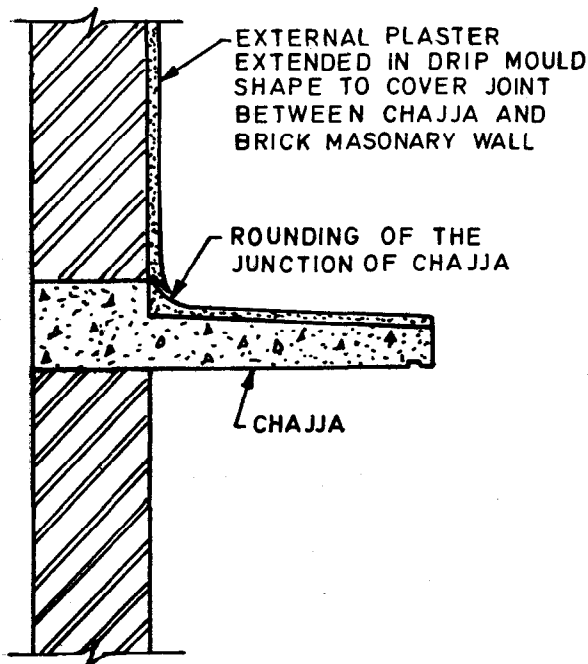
FILLET AT THE JUNCTION POINT OF WALL AND CHAJJA
